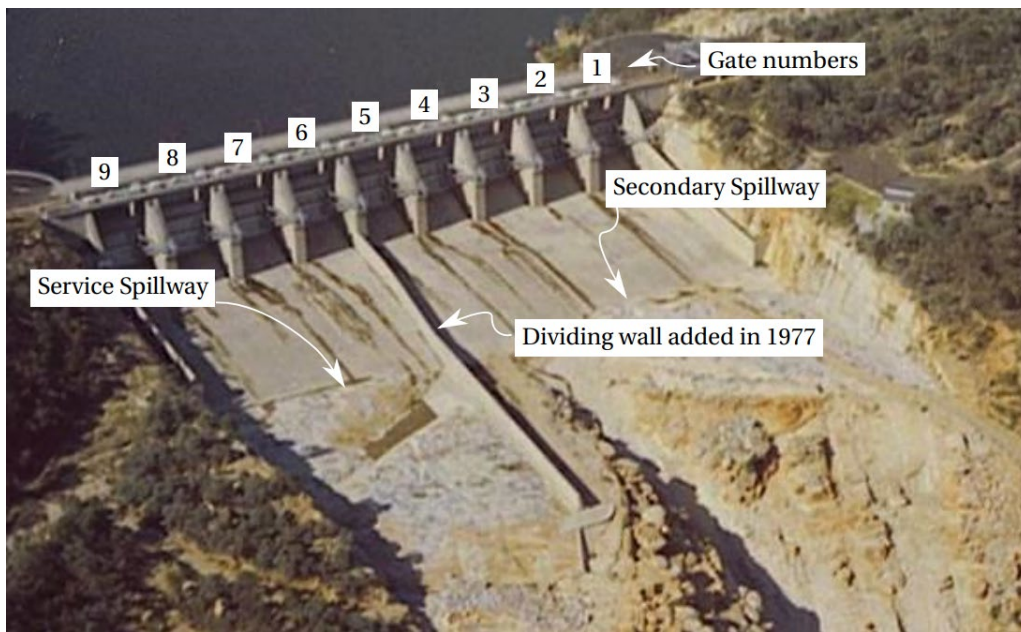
Division of the spillway into Service and Secondary. Erosion was primarily in the (now) secondary spillway. Note repair work (‘swimming pool’) at the end of the slab in the Service Spillway.
